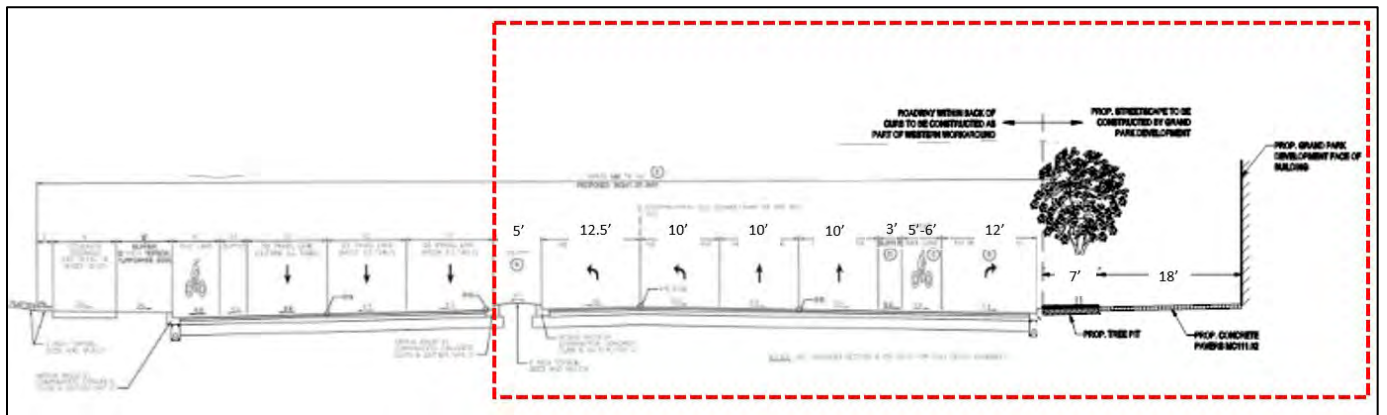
Proposed Old Georgetown Road North-South Section (Subject Property Frontage Identified within Red Dashed Outline)
